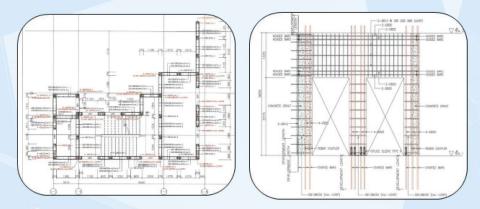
Plan and Details of Insitu and Precast Concrete Shear Wall
